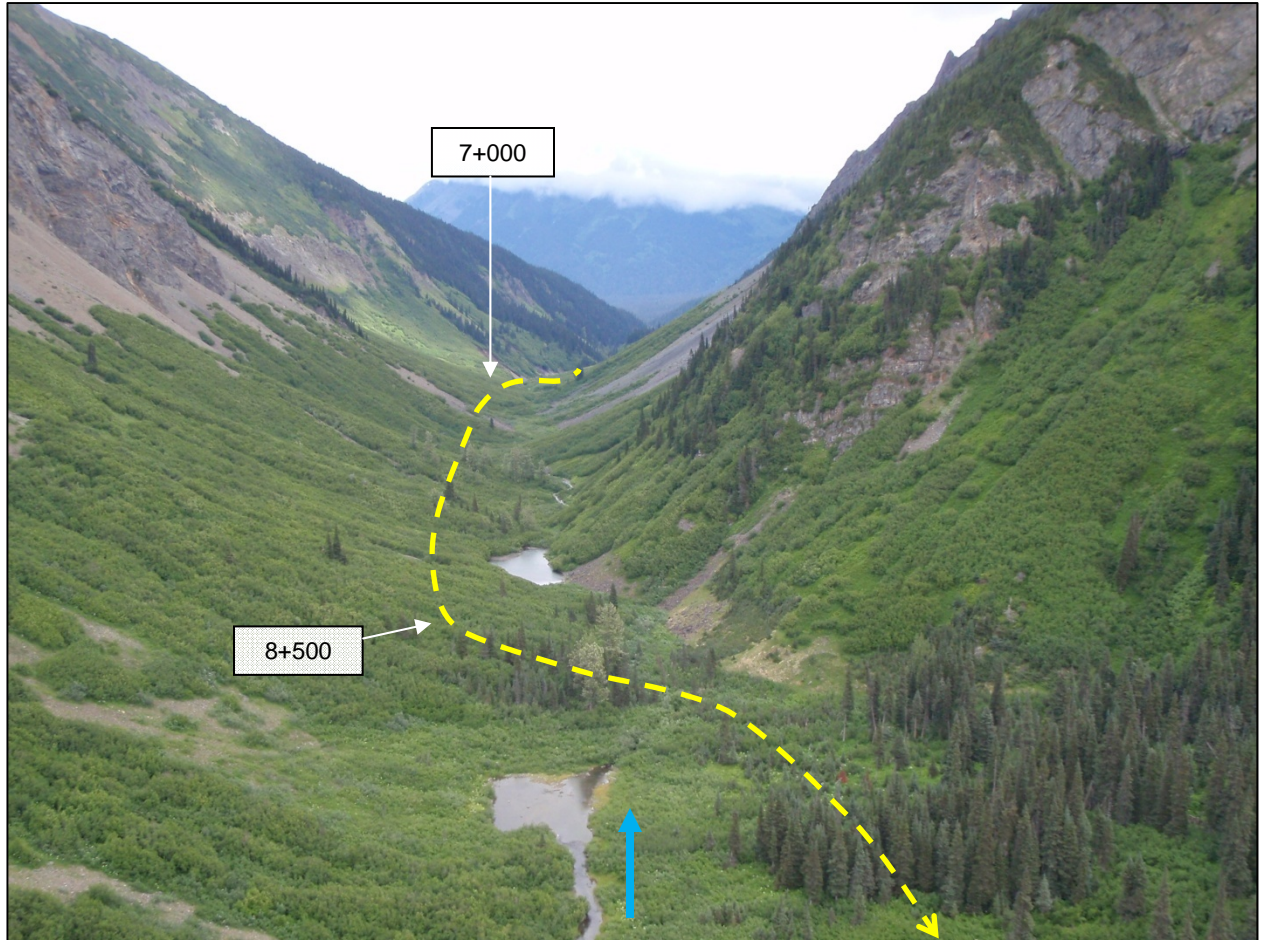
Tunnel Spur Access Road – Looking upchain (west) up the western tributary of Teigen Creek.
